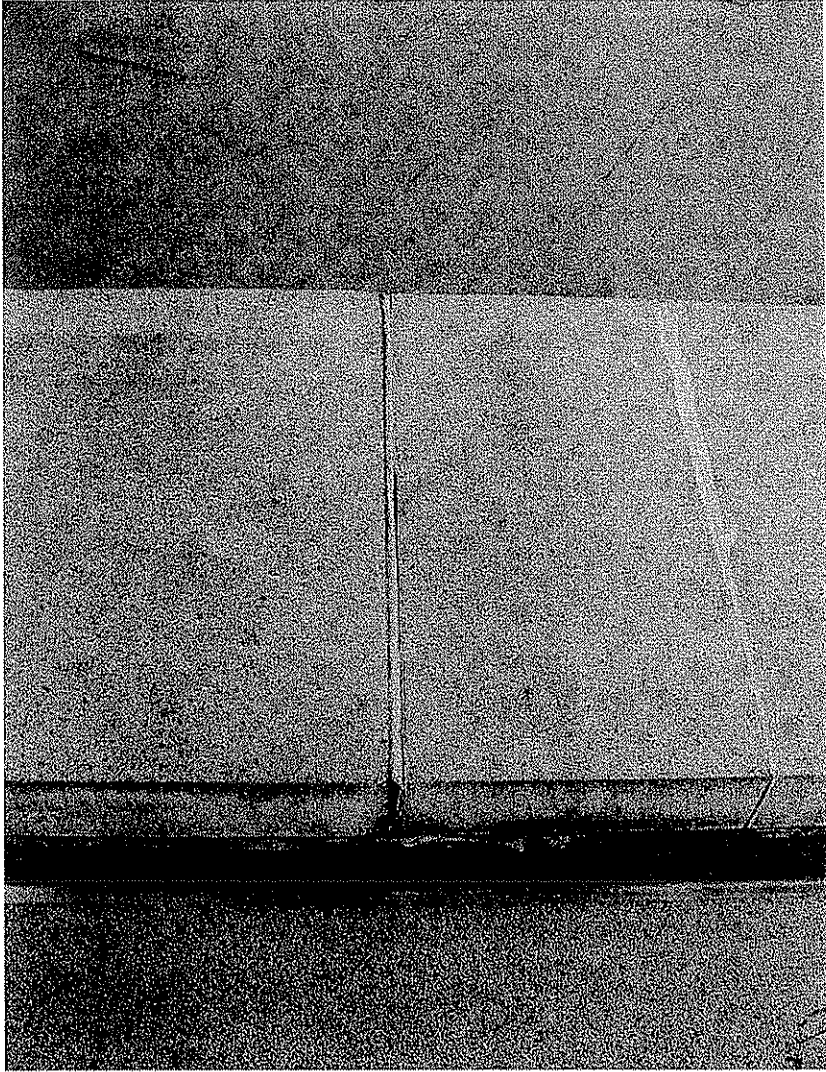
Failing Sealant Joint to Butt Joint Between Coping Stones
